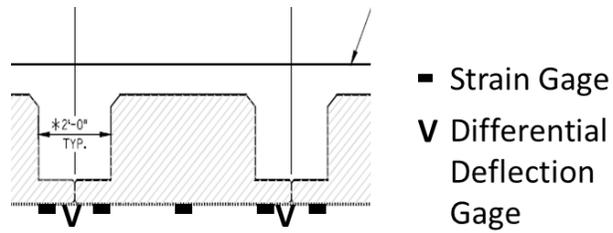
US 41 over Ashwaubenon Creek instrumentation locations - typical cross-section
